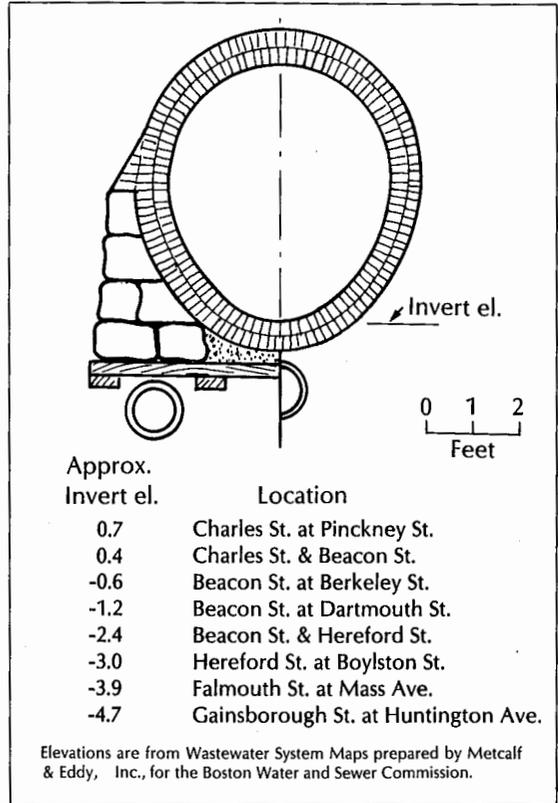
A typical cross section of the West Side Interceptor. Invert elevations at selected locations are noted.
